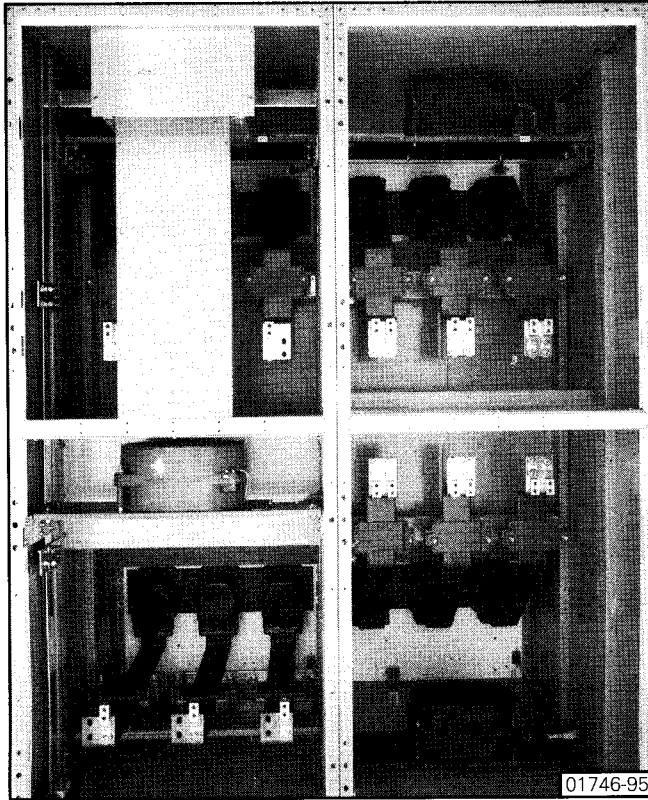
Typical Cable Termination Compartments (Unit on left has top breaker cables exiting top, and bottom breaker cables exiting top through "chimney" or trough. Unit on right has top breaker cables exiting top and bottom breaker cables exiting bottom.)
